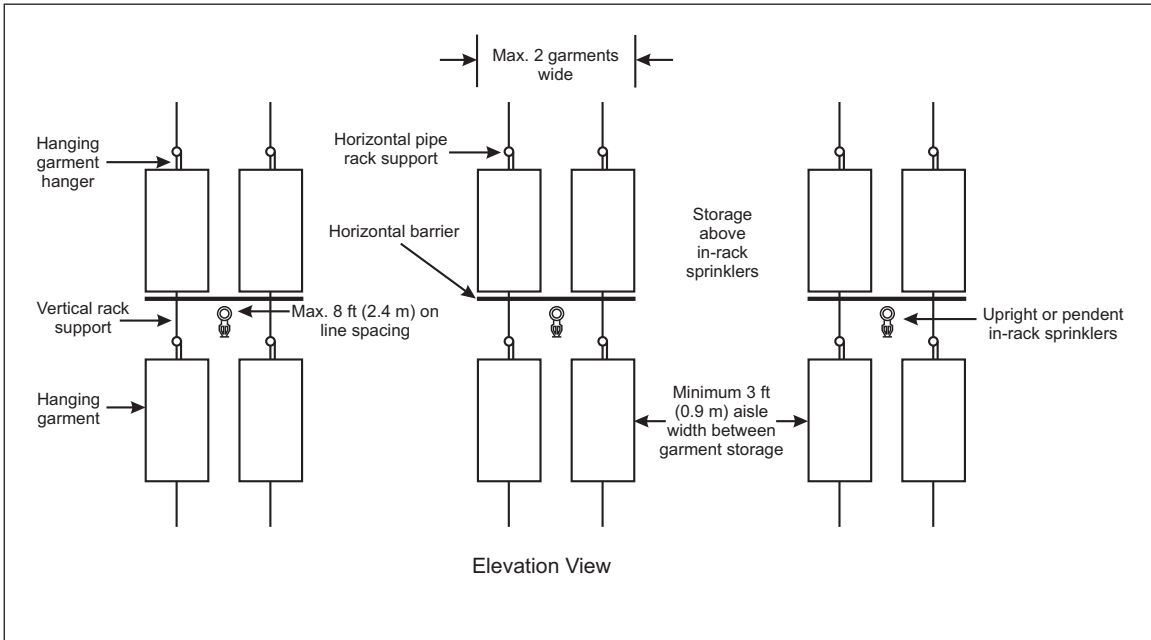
Horizontal location of in-rack sprinklers for storage up to 2 hanging garment rows wide with horizontal barriers
